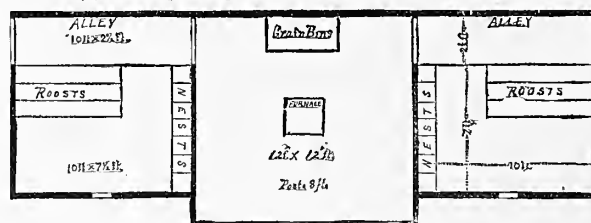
GROUND PLAN OF POULTRY HOUSE.
